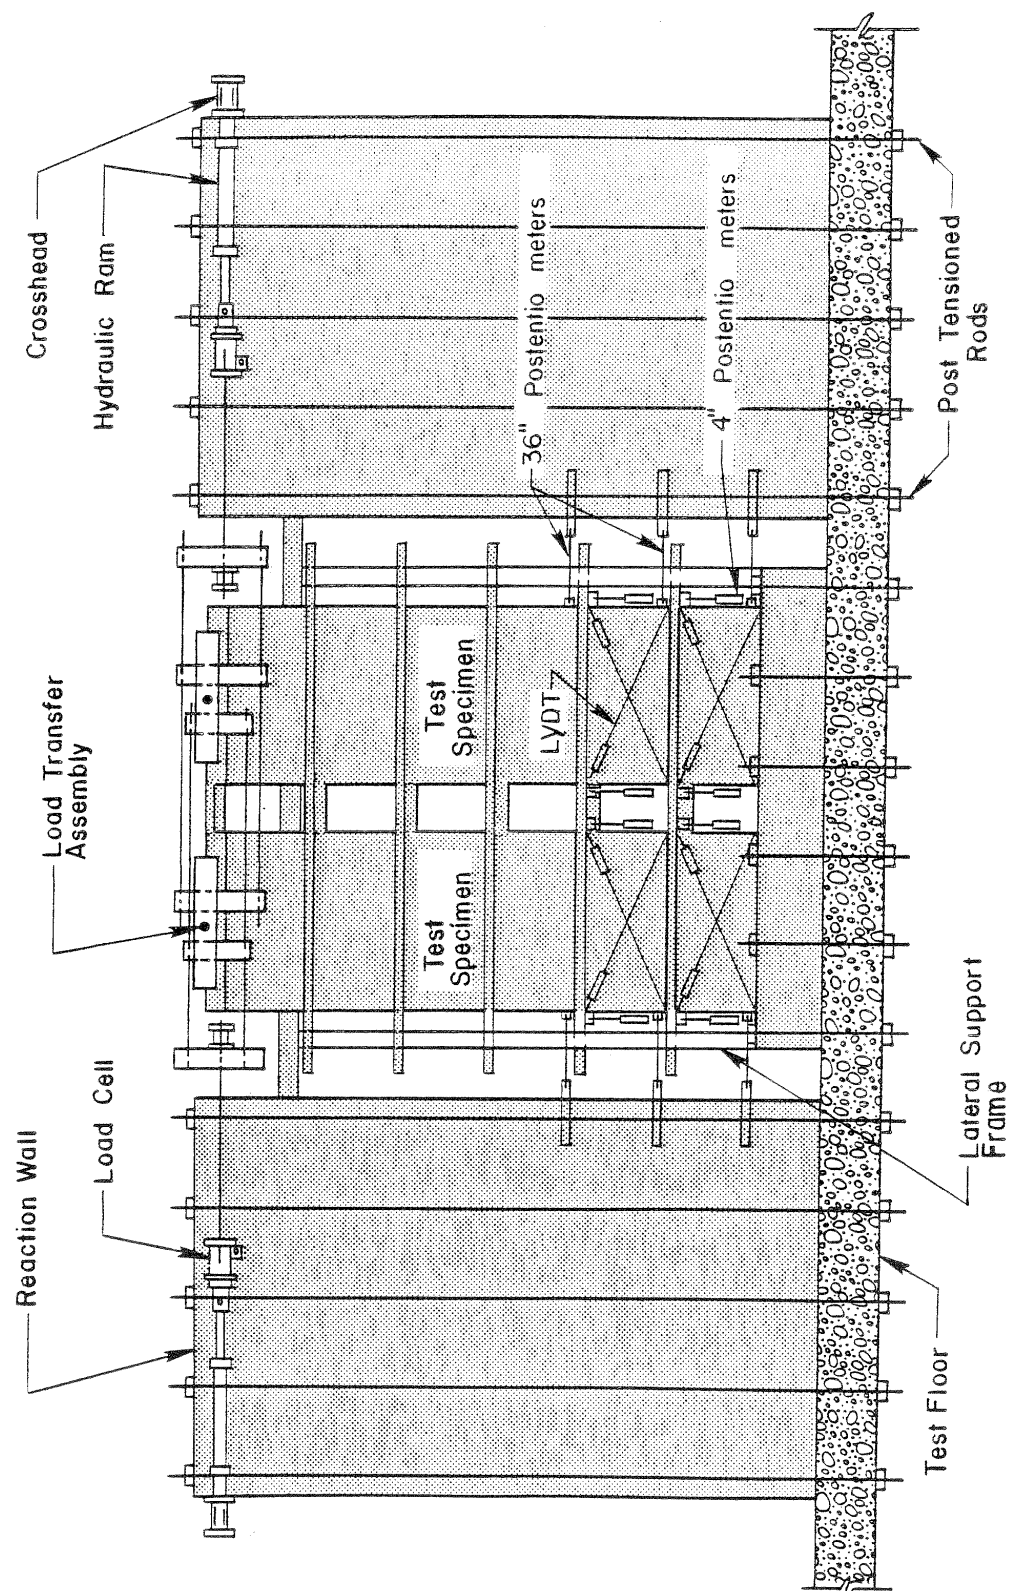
Test set up for walls tested by Shiu et al. (1981)
